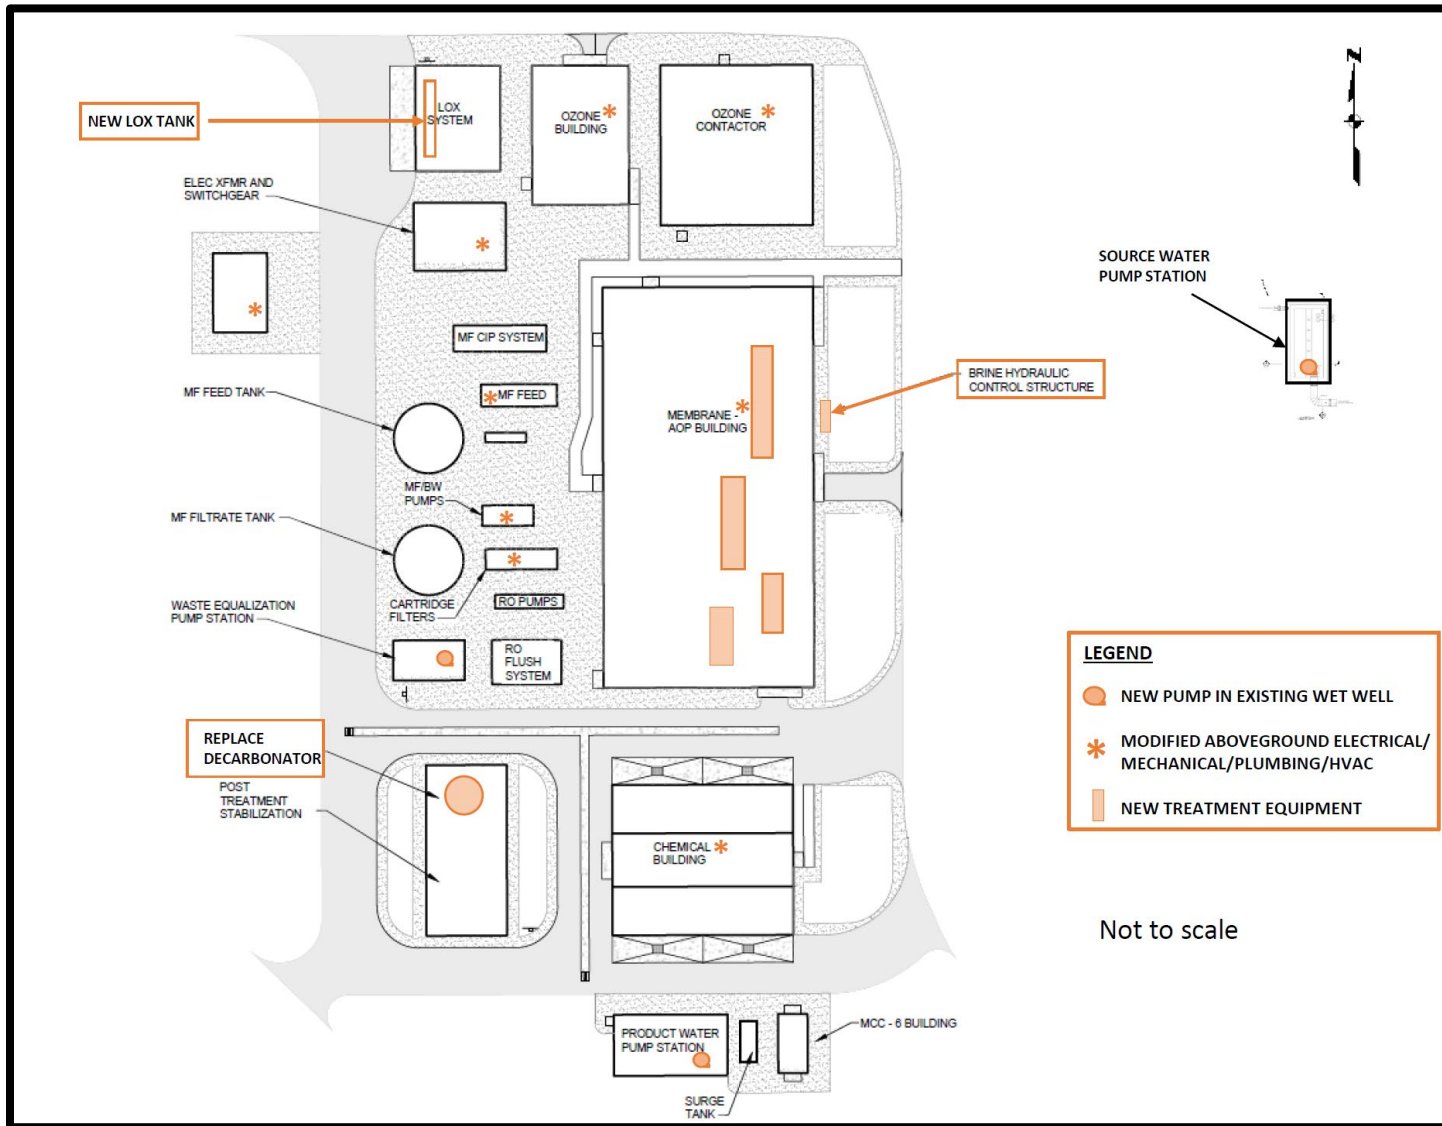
Advanced Water Purification Facility Expansion Site Plan
